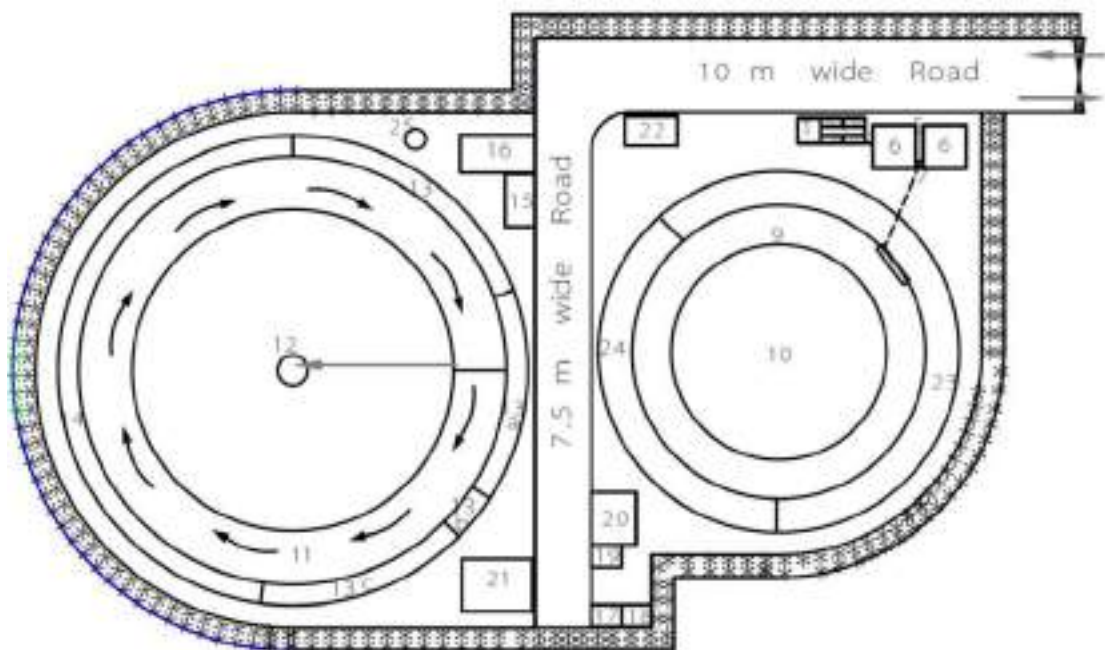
Layout of the civil units at the 31 MLD Thiruvottiyur STP of CMWSSB
